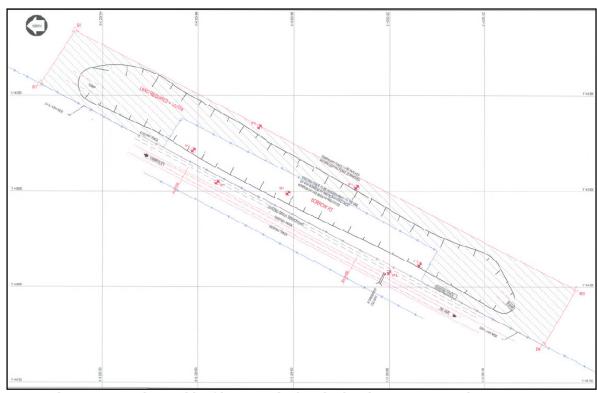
Heuningneskloof borrow pit sketch plan (Transnet, 2012)
